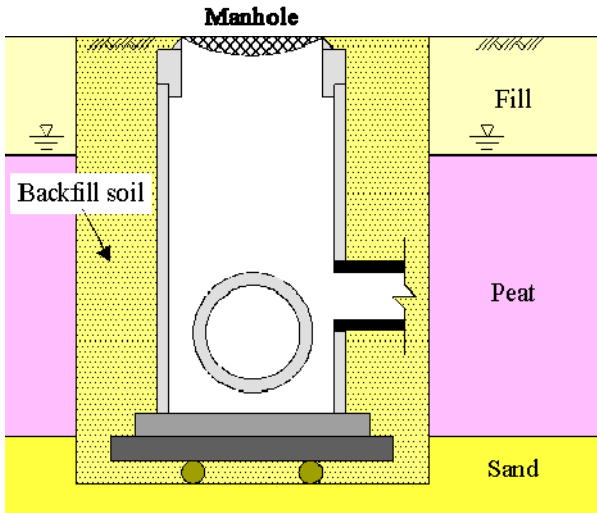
Schematic diagram of the cross section of a sewage manhole
